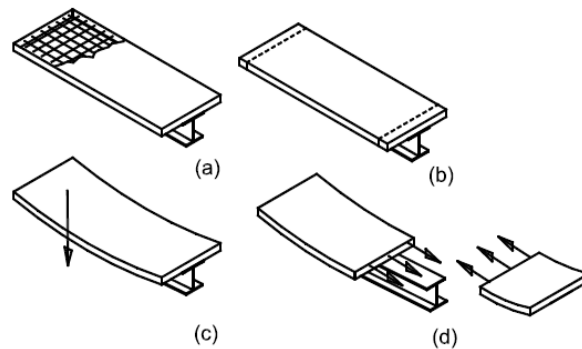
Mechanism of transverse cracking. (a) Concrete is poured. (b) Concrete shrinks, (c) Due to restraint from girder, concrete shrinkage produces downward deflection. (d) Tensile stress is developed in deck, which causes transverse cracks - Courtesy of New Jersey D.O.T. (2002)
